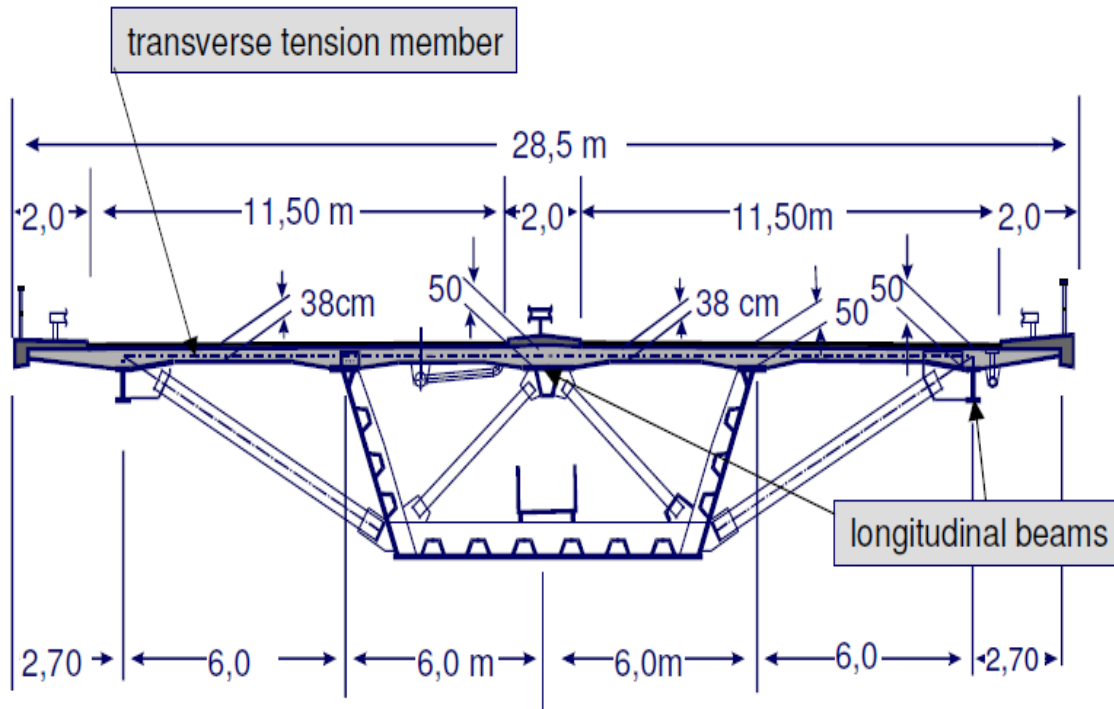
Typical cross-section of a box girder with wide concrete decks [5]
